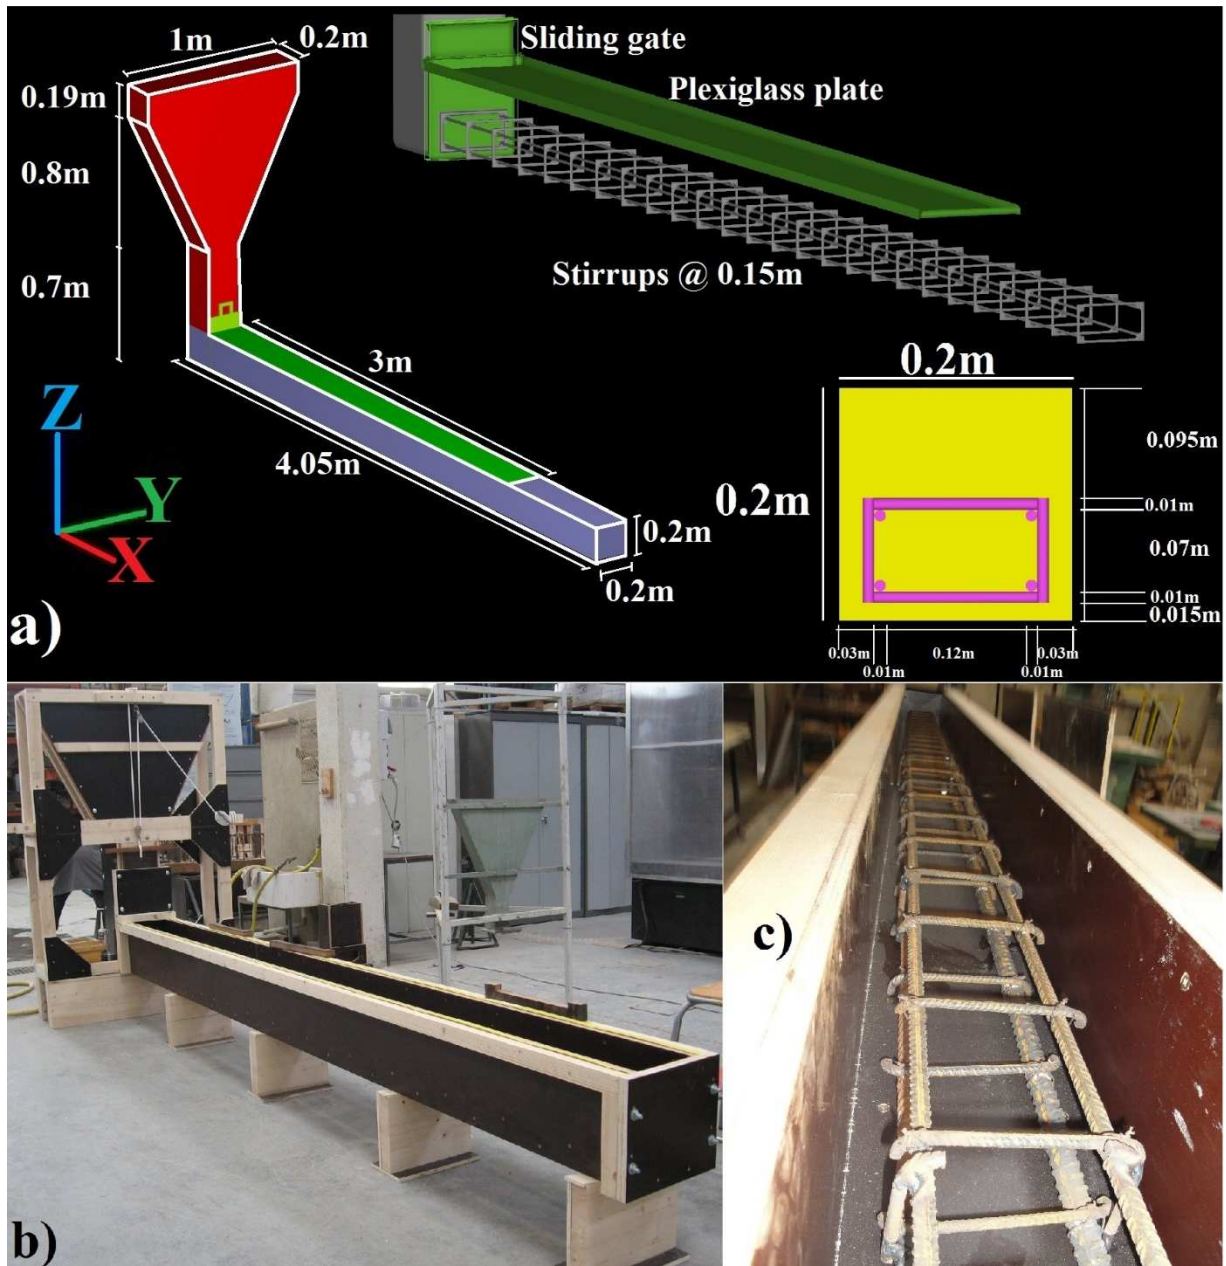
1 a) Schematics of the L-shaped beam and reinforcement bars arrangement, b) formwork of the beam, and c) cage of the reinforcement bars
